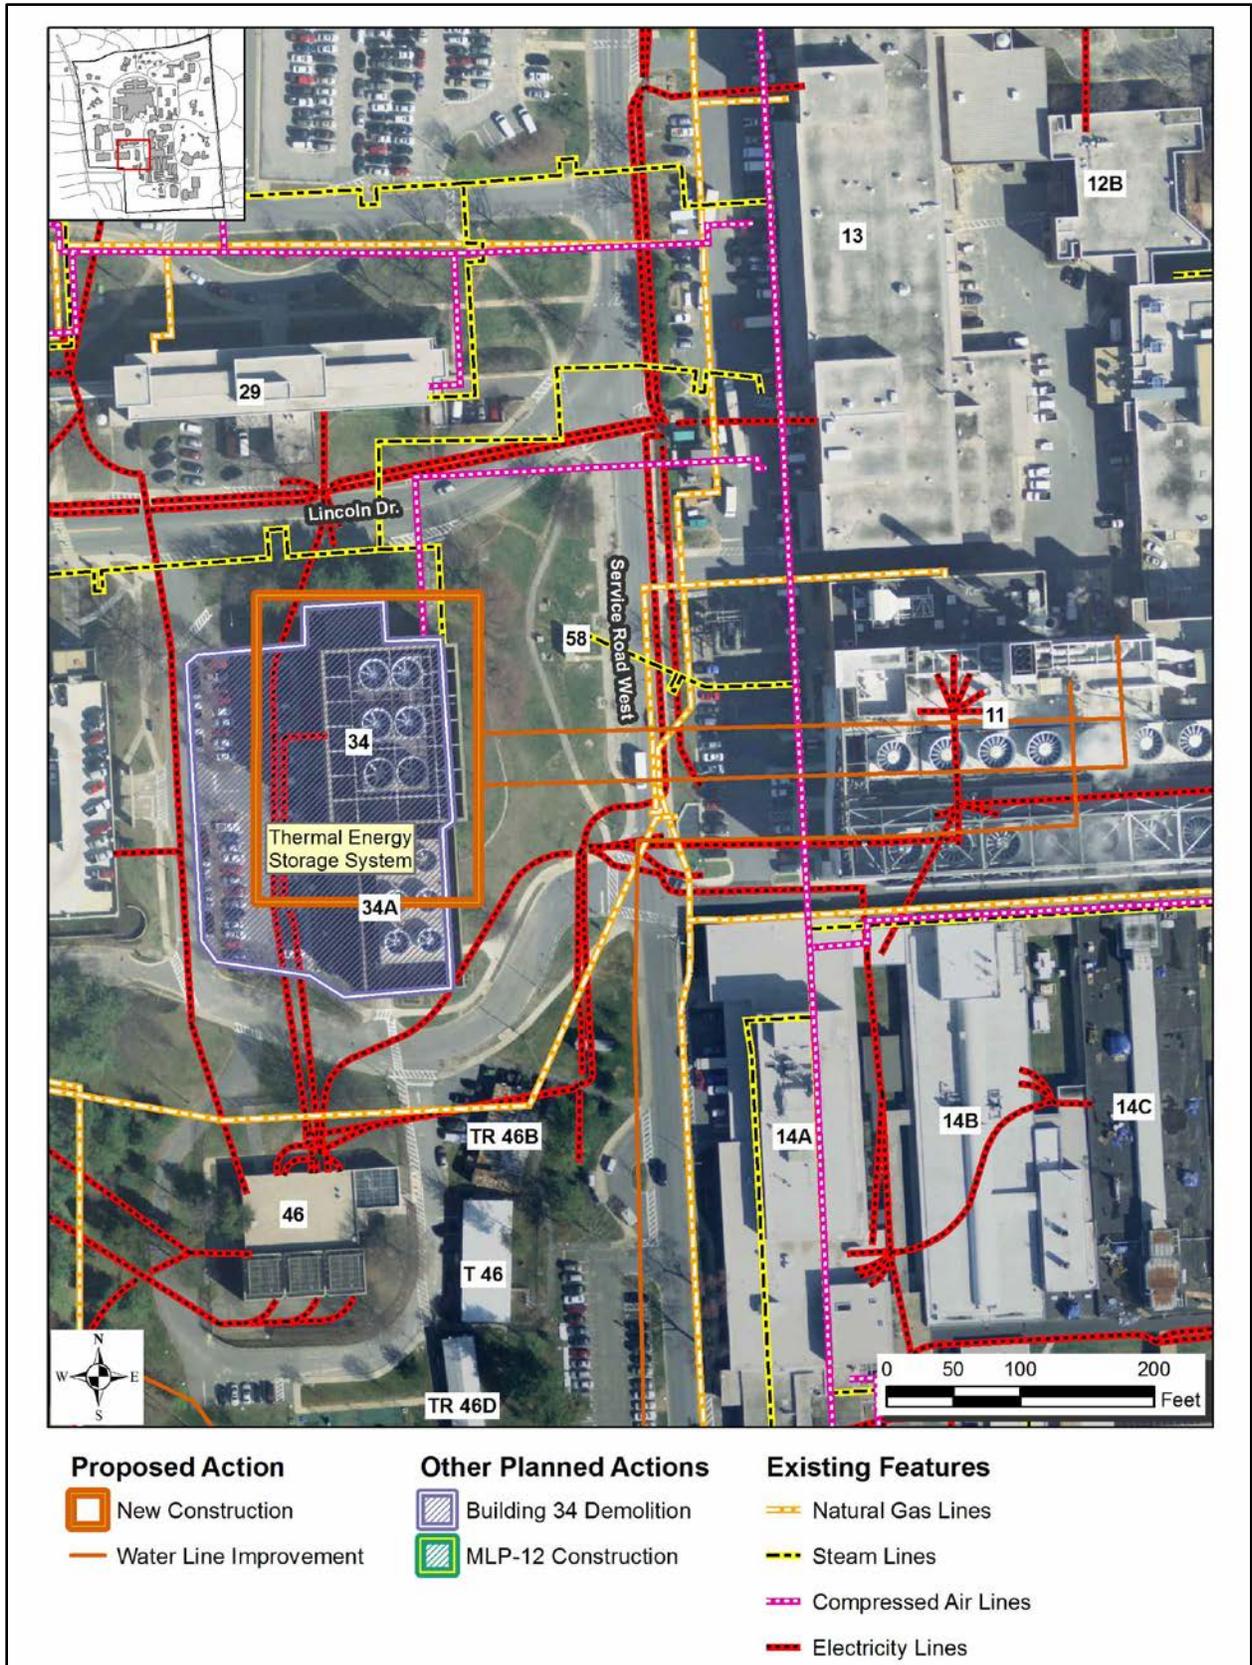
Existing Steam, Natural Gas, and Electricity Map, Building 34 Site
